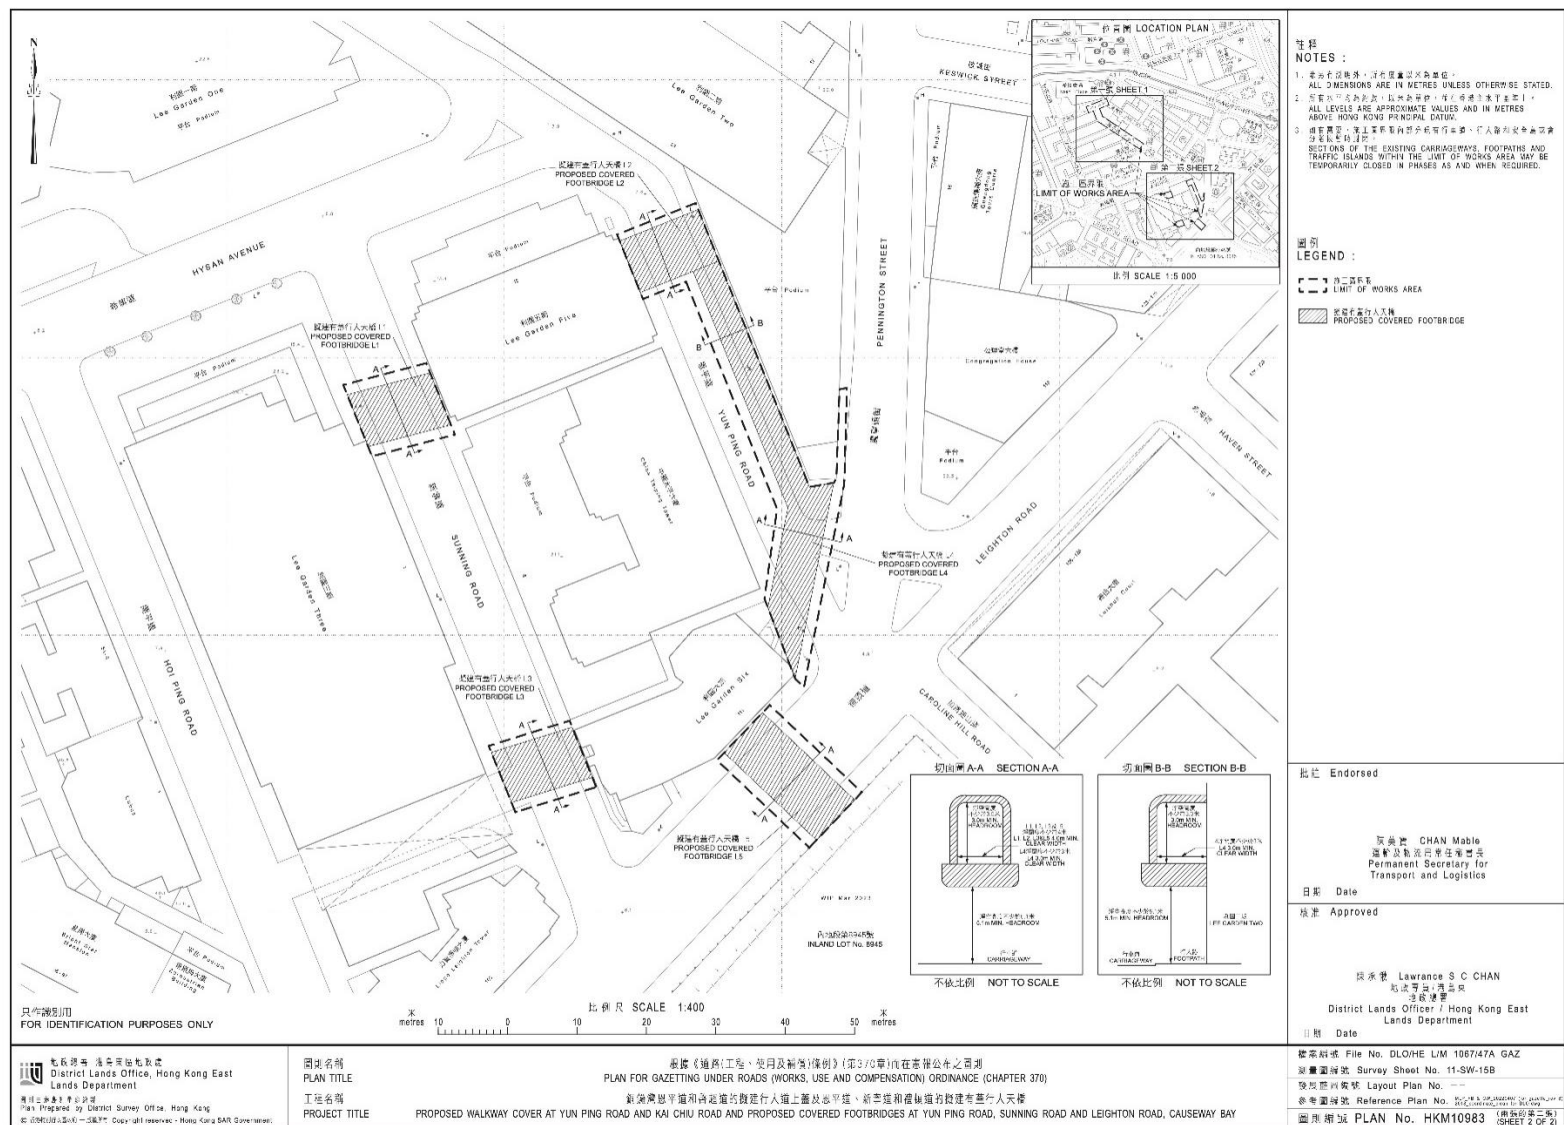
Plan showing the location of the 5 link bridges at Yun Ping Road, Sunning Road and Leighton Road, Causeway Bay.
